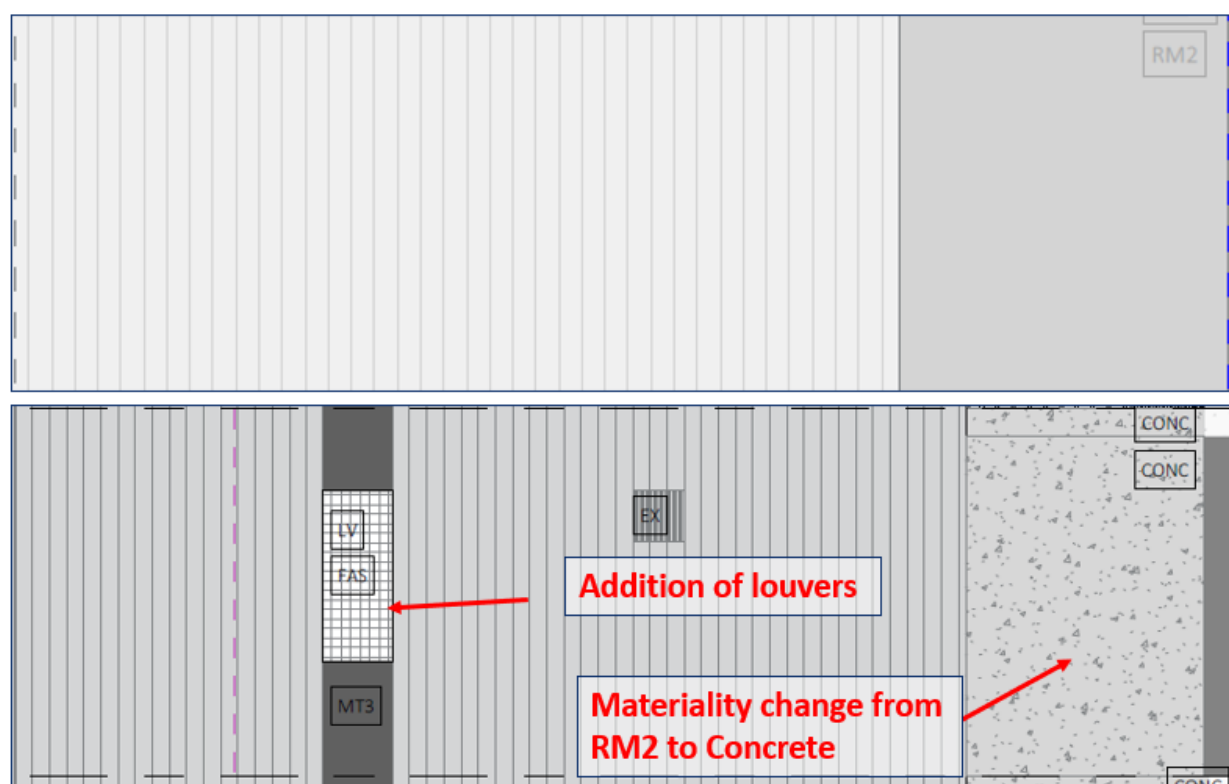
| Approved (above) and proposed (below) western façade Level 3 (Source: Department's Stamped Plans 2022 and Applicant's SEE 2023)
